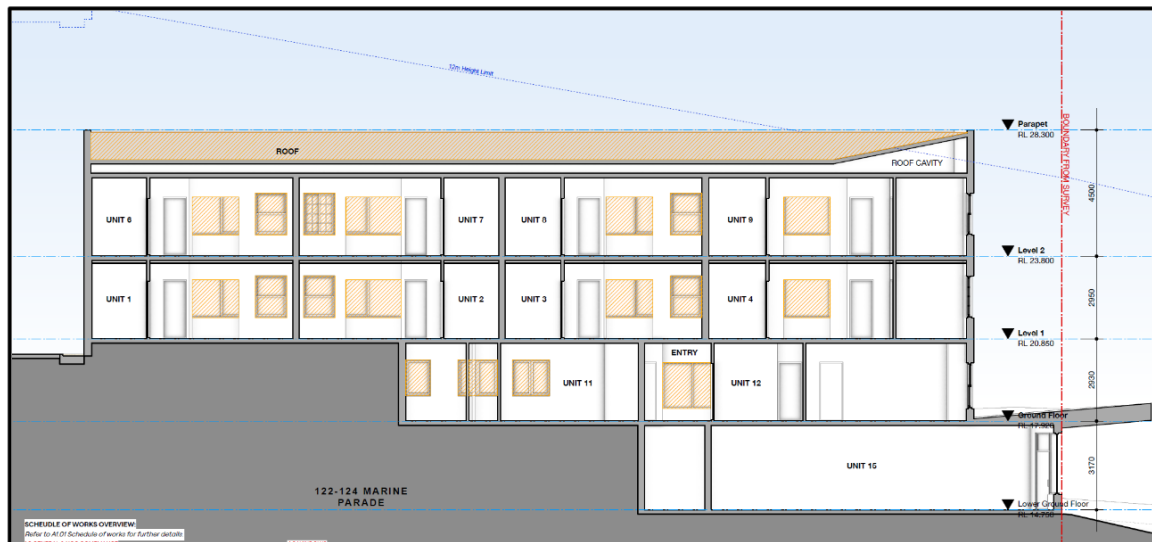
Excerpt of long section, noting that the existing built form breaches the 12m height limit
